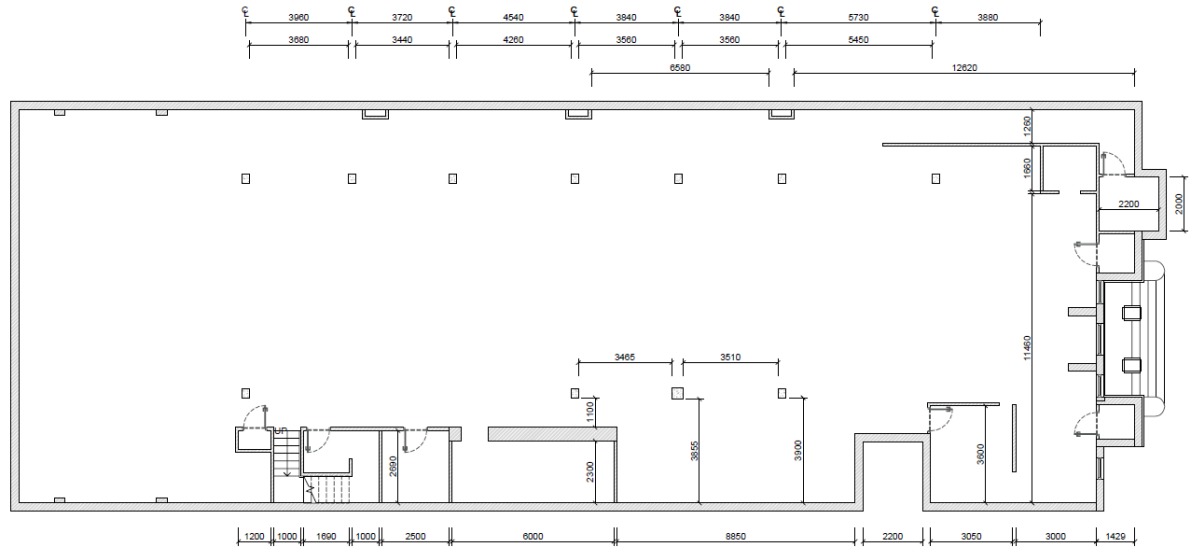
Existing ground floor 587.63 m² (source: architectural plans)
